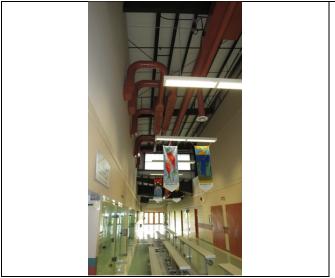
C3033 Painted Ductwork & Ceiling Purlins
